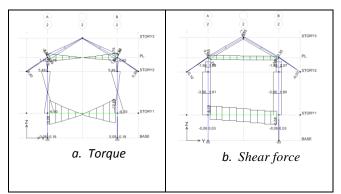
Internal force in beams, columns with reinforced walls on both sides of columns
